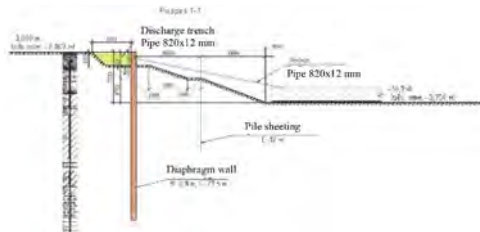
The layout of the diaphragm wall in soil conditions of the construction site.
